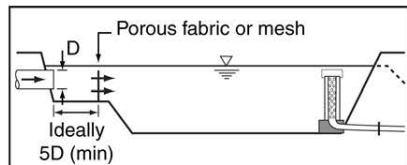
(b) – Typical layout of inlet chamber with opposing inlet pipe (Type C basin)
